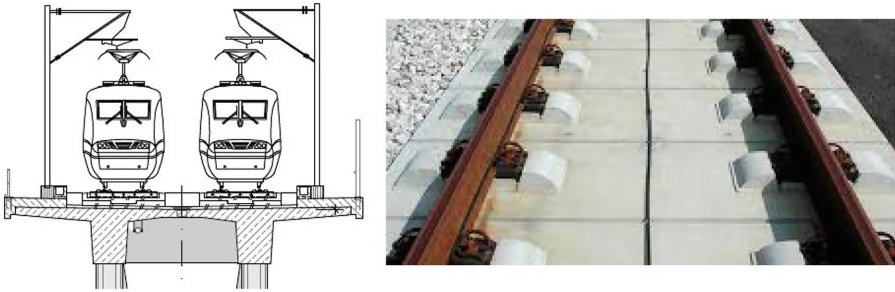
An example of a cross-section of railway bridge with a slab track (left) and slab track construction (right).
